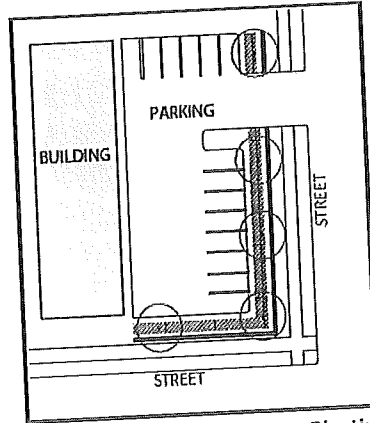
Landscaping Buffer with Evergreen Plantings—Plan View
